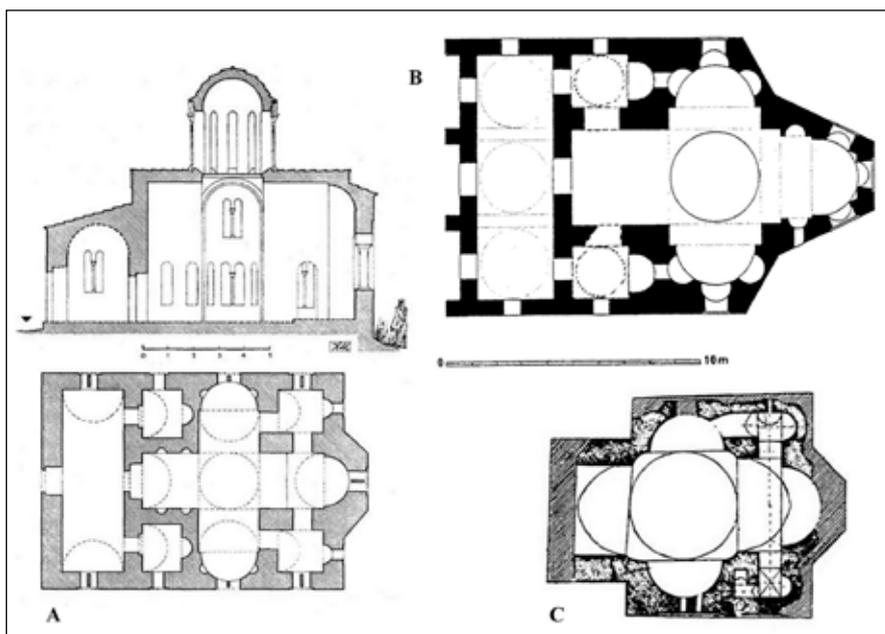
A – Church of St. Nicholas in Aulis, ground plan and longitudinal section looking north (after Ch. Bouras); B – Church of St. Dēmētrios in Varassova, ground plan (after S. Ćurčić); C – Church at Vineni (near Ohrid), ground plan (after Ђ. Janković)
